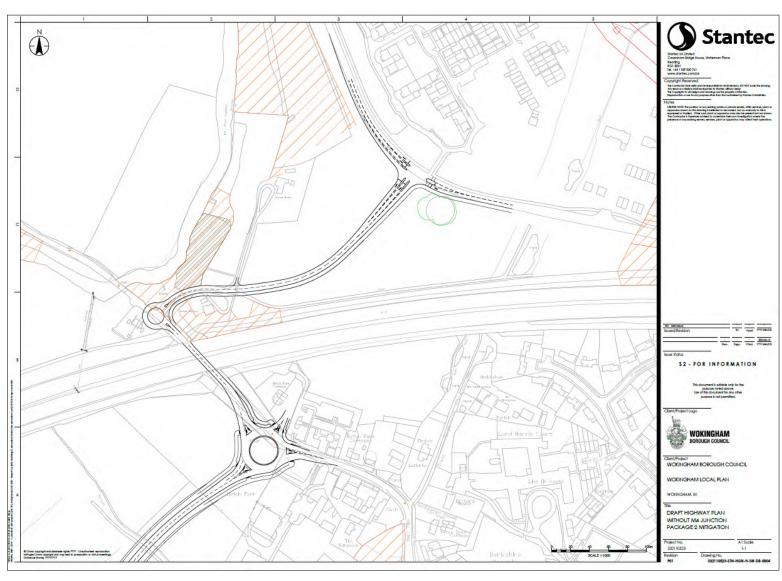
New access to Mill Lane and Connection to Winnersh Relief Road
